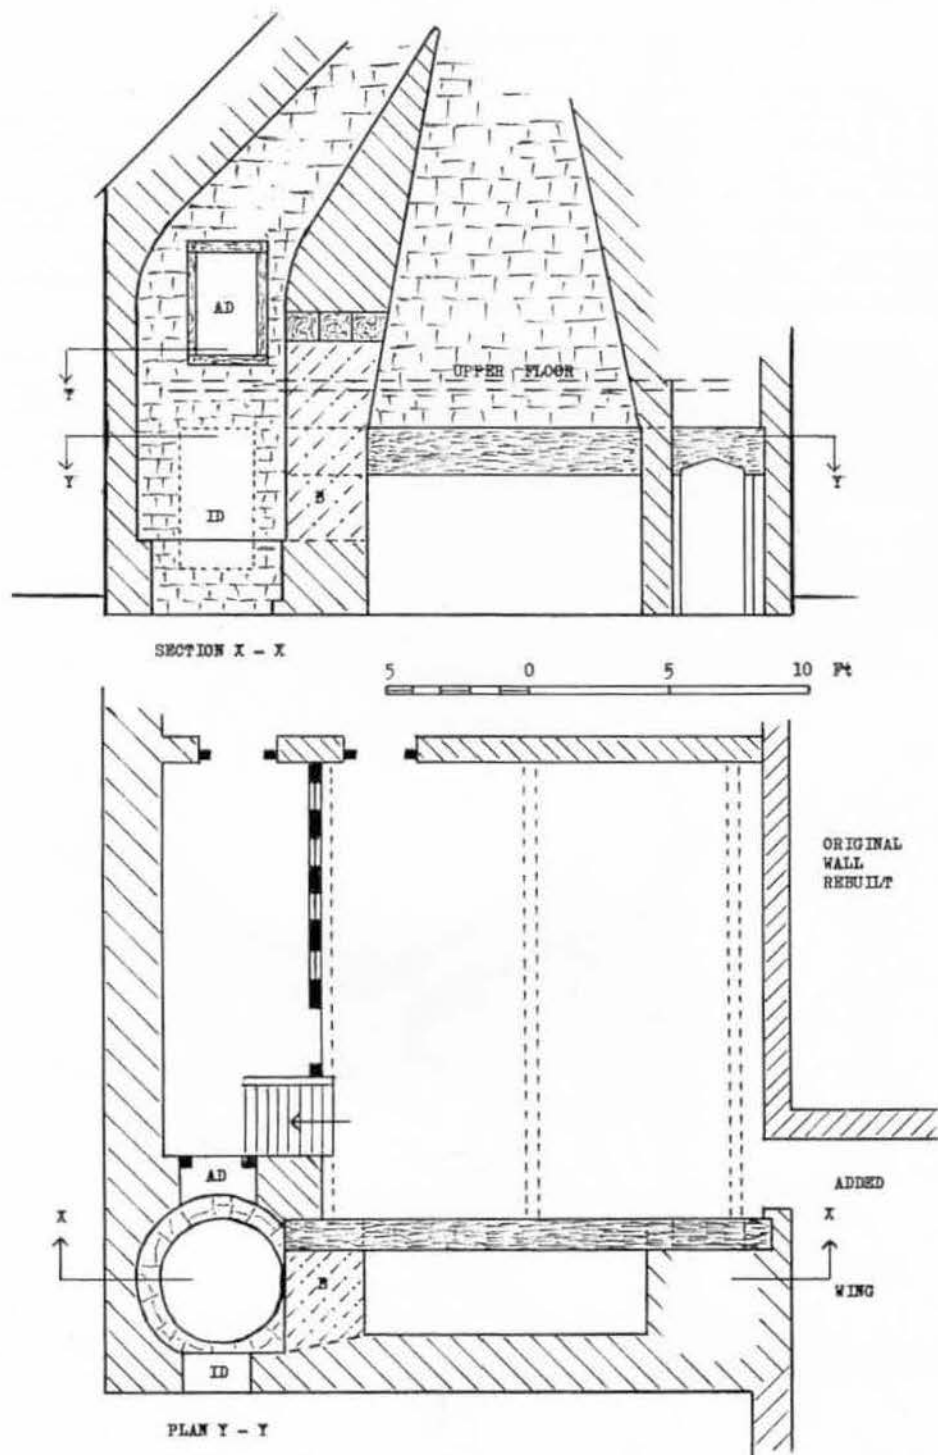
Pendyn, Nailsbourne, Kingston St. Mary. Plan and elevation of type 2A curing chamber.
